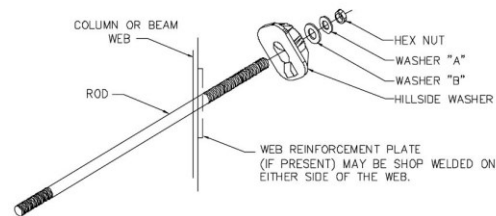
Typical juncture of rafter-to-column and rod bracing to rafter and column connections
